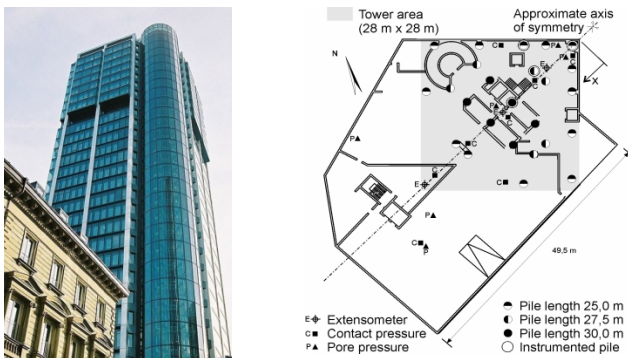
Eurotheum, Frankfurt am Main: View and ground plan with piles and measurement devices
